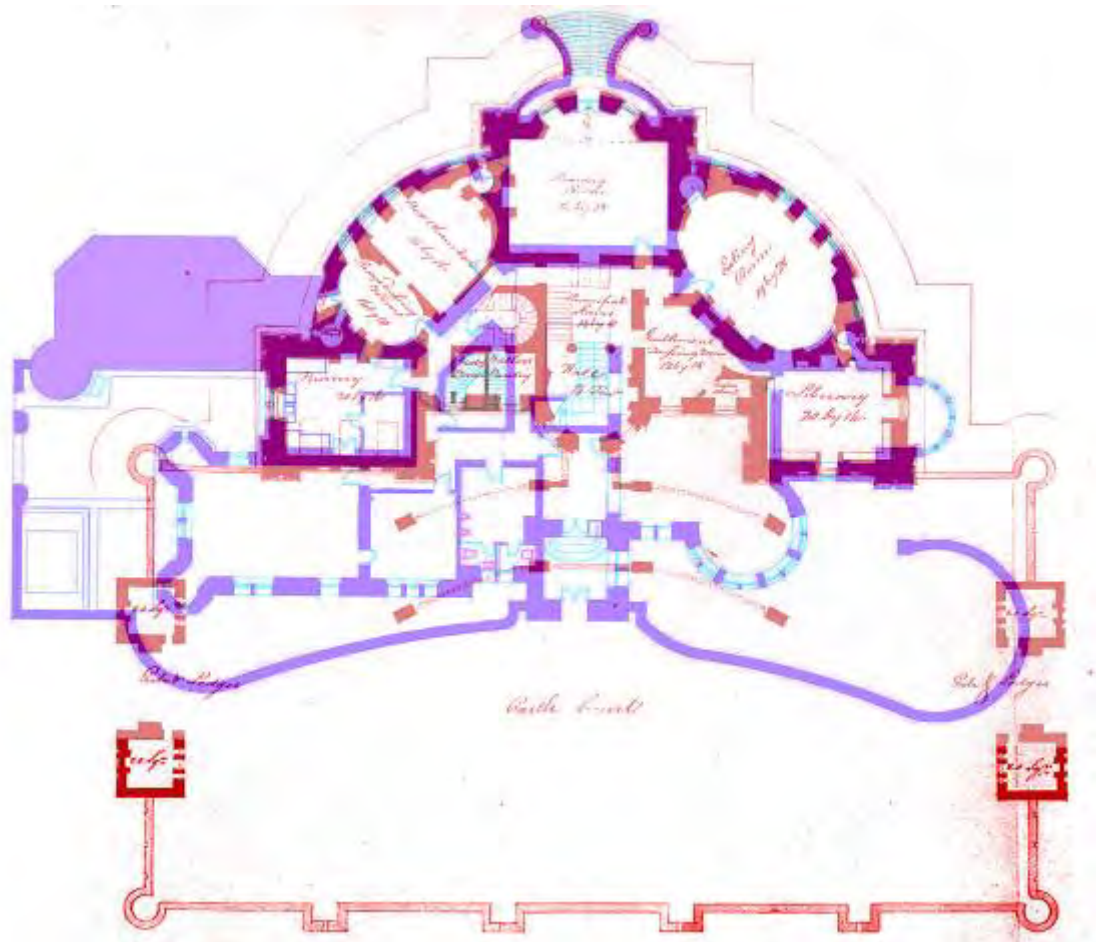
Principal floor. Current plan in purple, 1790 Adam plan in red. *UoSA, SJSM, S&B
